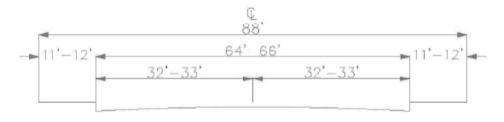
CITY OF SAN BERNARDINO GENERAL PLAN ROADWAY CROSS-SECTIONS
